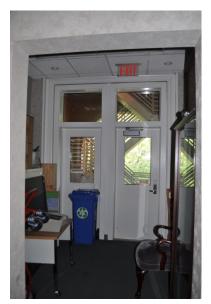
Third floor, west office suite, west emergency exit onto west balcony (in former window opening).
